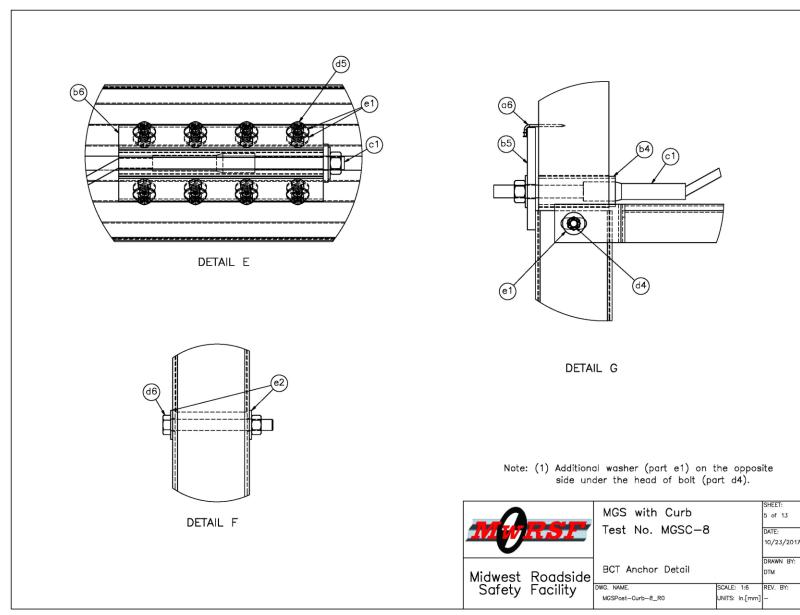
BCT Anchor Detail, Test No. MGSC-8
